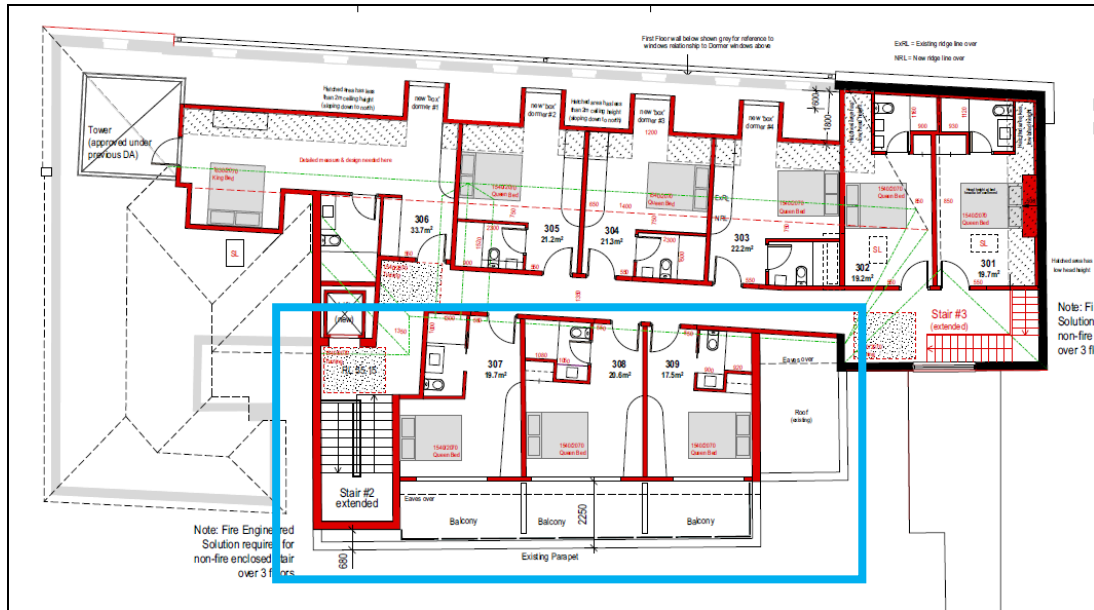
Extract of Second Floor Plan original submitted showing extension of second floor (highlighted in blue)
